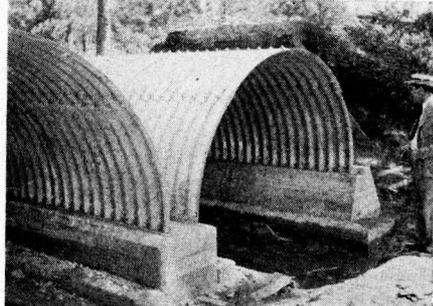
Shallow Gravity Wall with Arch Sides. Courtesy of Toncan Culvert Mft. Assn.
